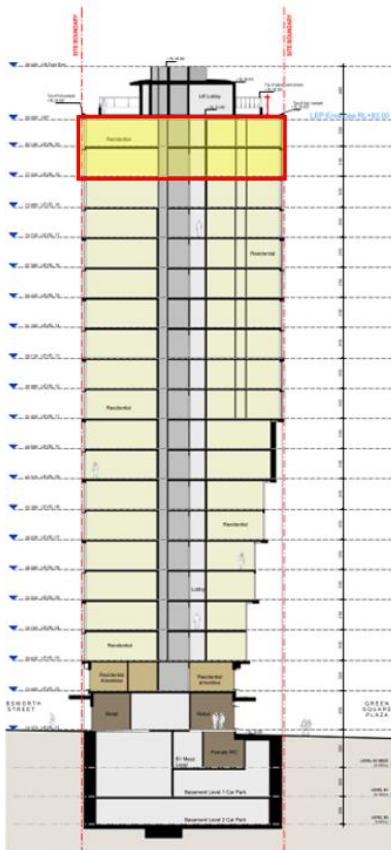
Section of Site 18 with the additional two storeys highlighted in yellow
